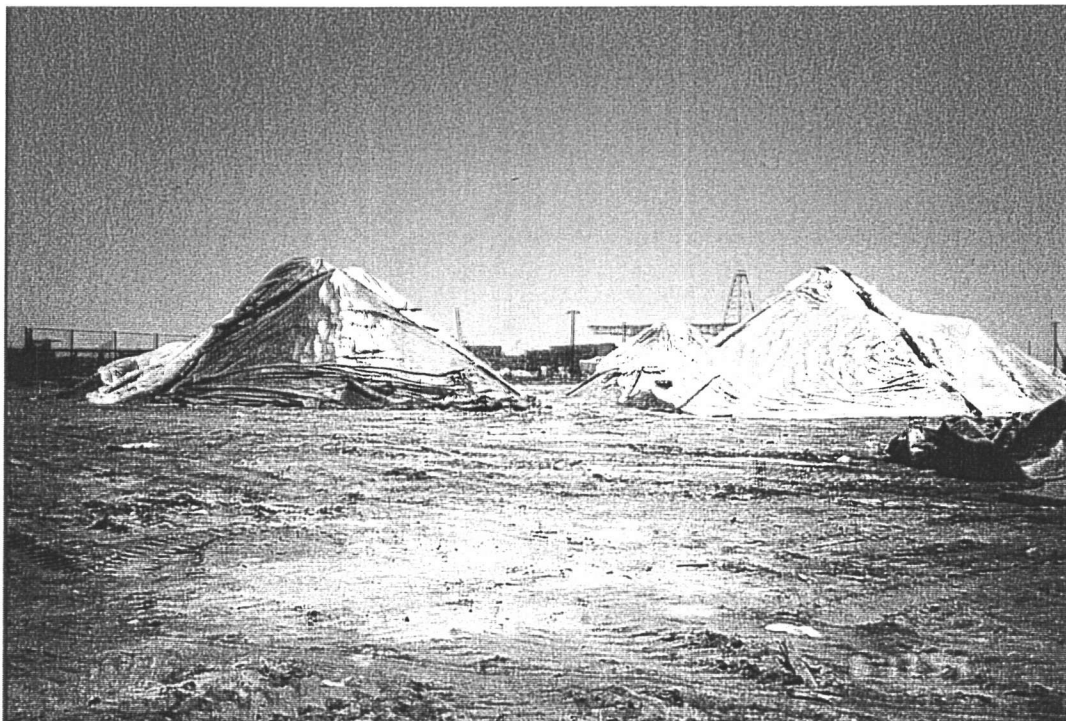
Covered grit piles awaiting transport to the asphalt hot plant.
